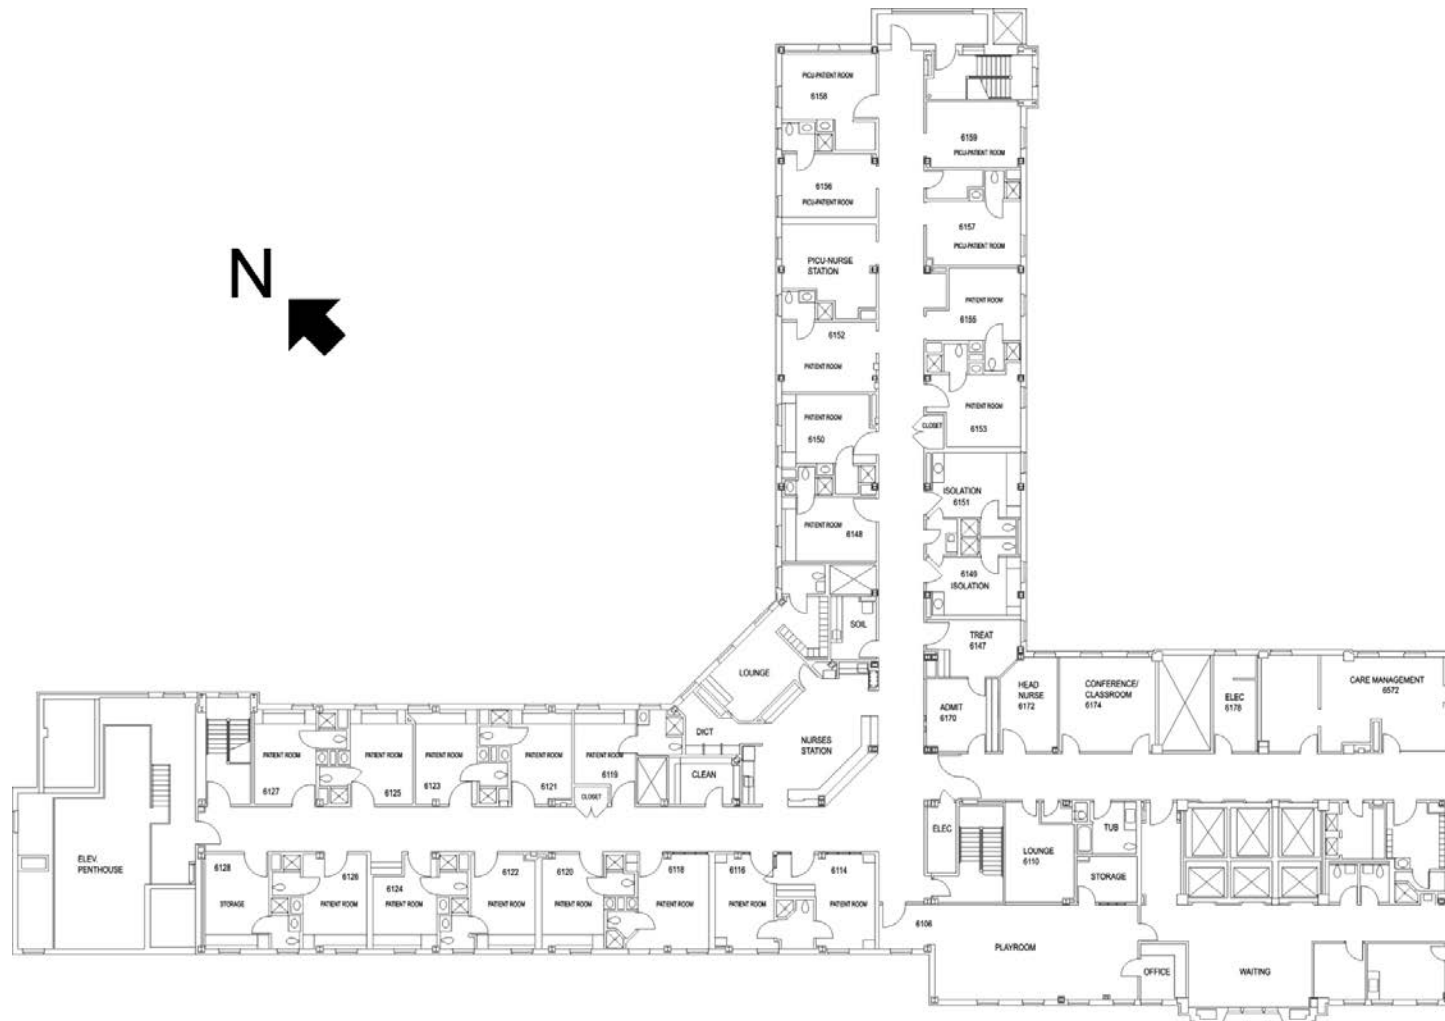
Current Pediatric Unit Floor Plan. Image Credit- the Builder.
